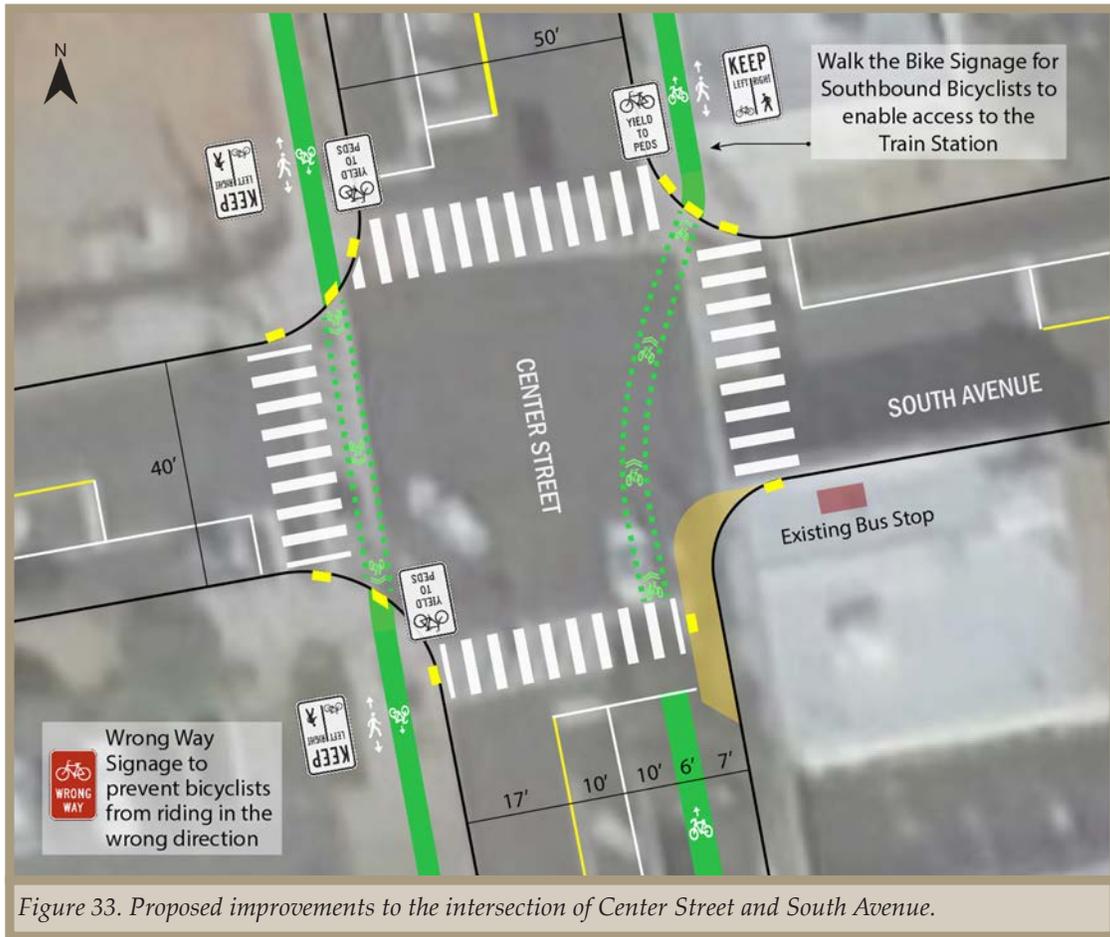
Proposed improvements to the intersection of Center Street and South Avenue.
